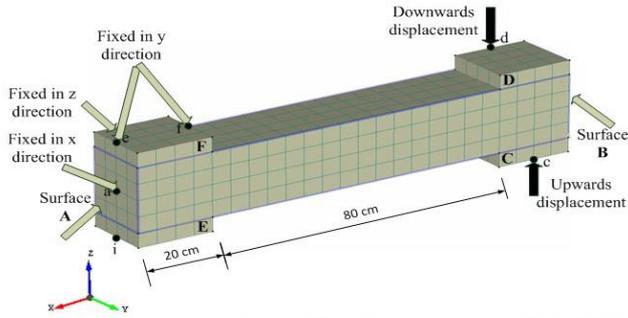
Geometry, loading, supports and mesh of the finite element model of the UHPC test beams [2]
